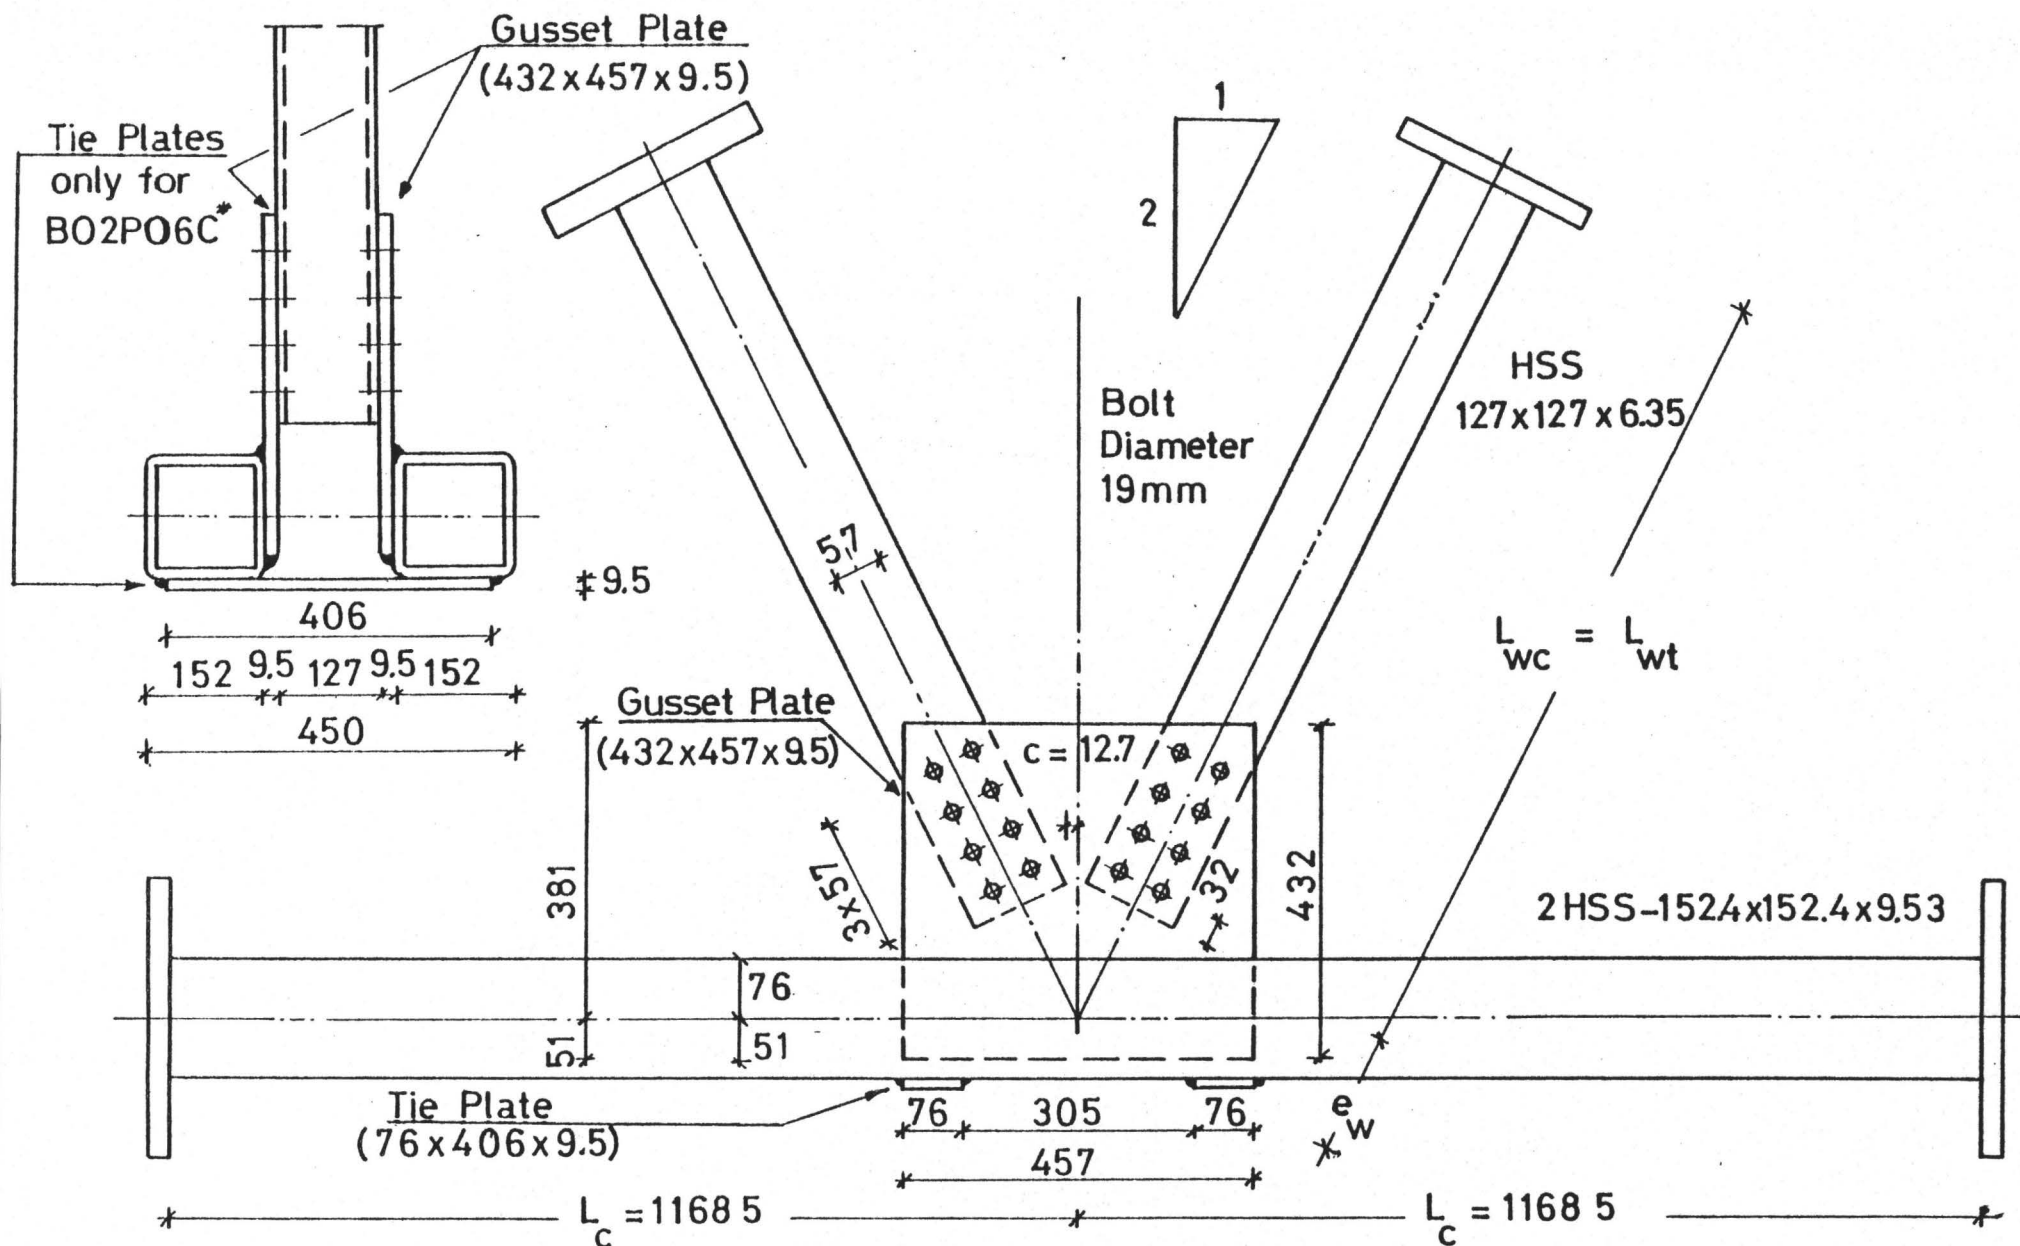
BOLTED CONNECTION (Dimension in mm)
